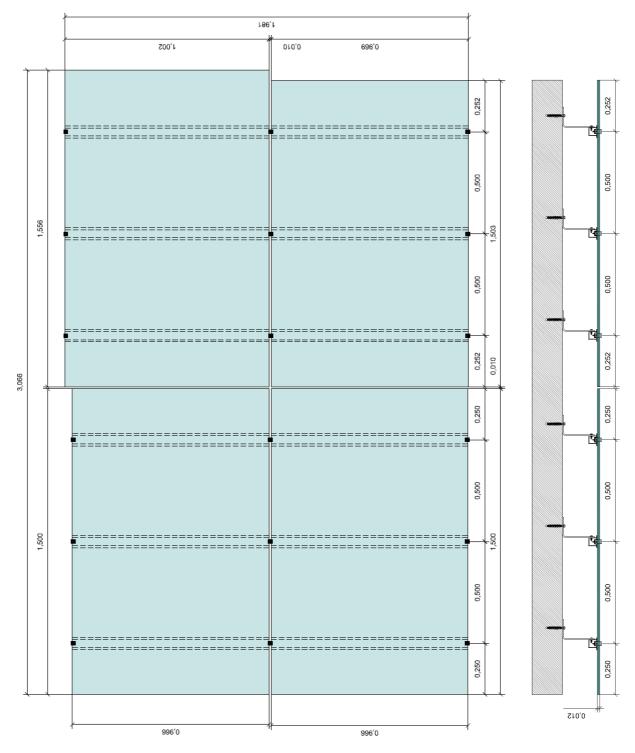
Assembly scheme of prototype X8-2 (horizontally oriented)
